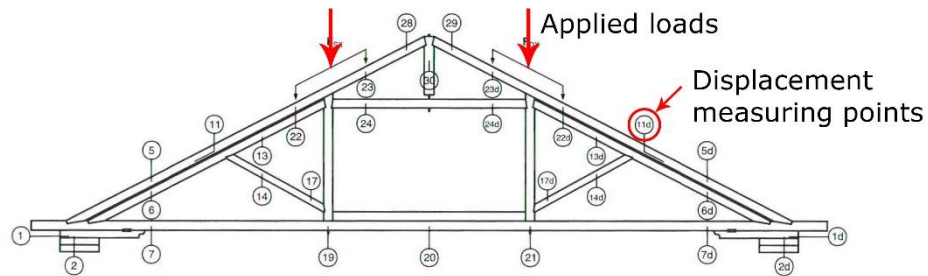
Testing layout of the 19th century Trento theatre roof truss (after [132])
